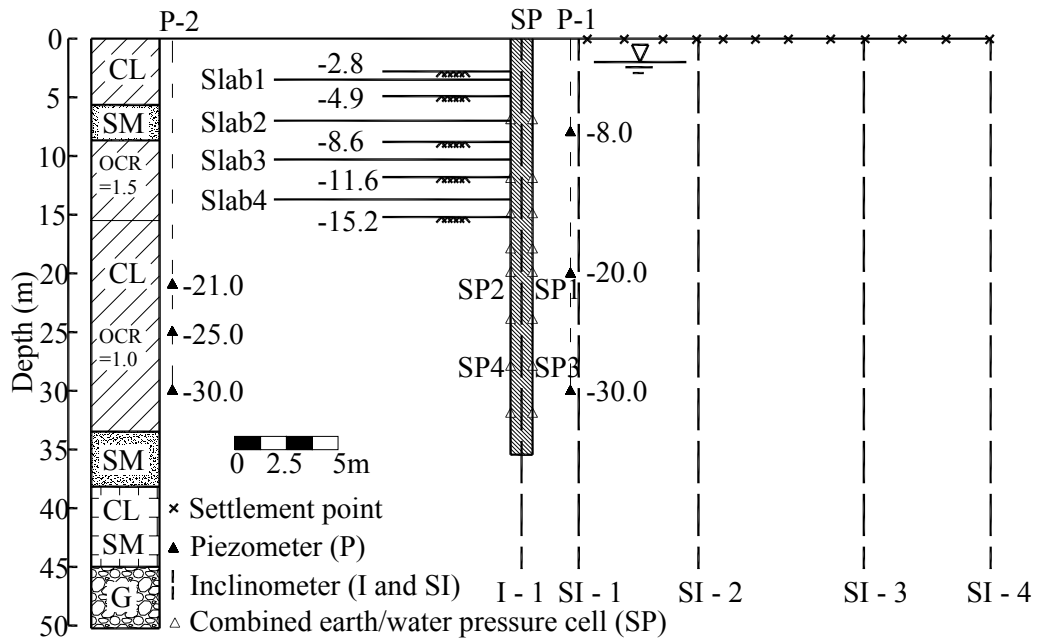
Excavation section view, modified after Ou et al. (1998)
